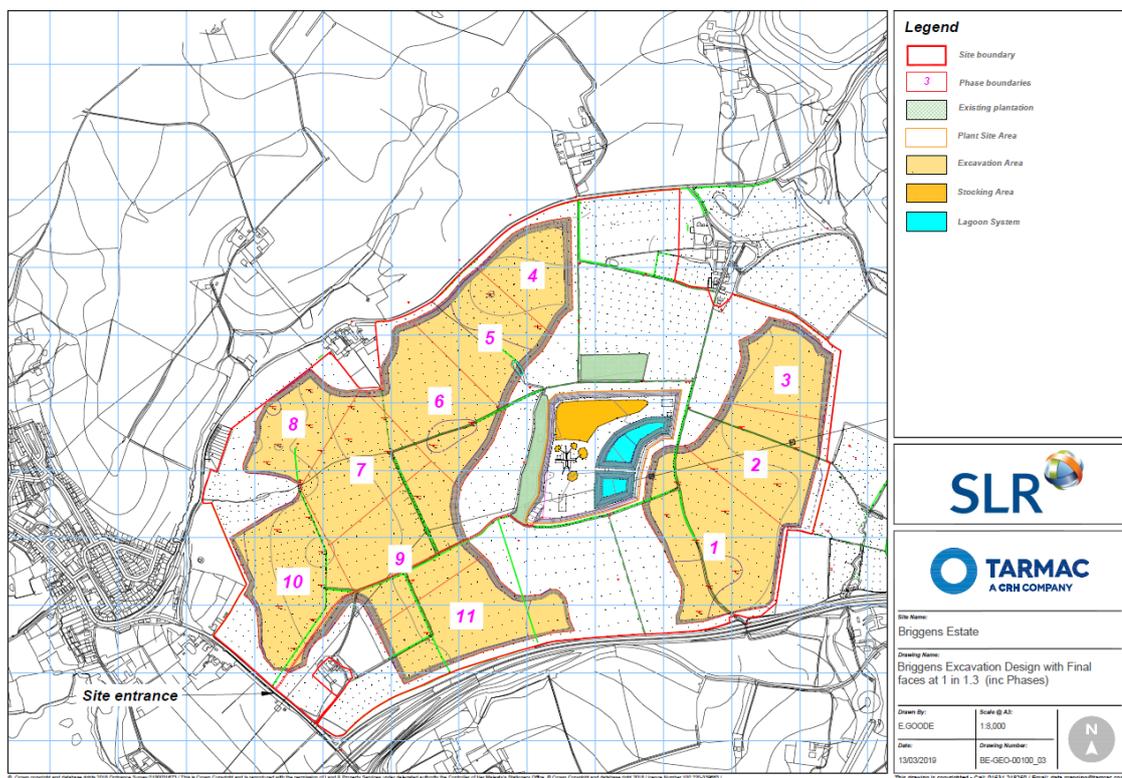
Indicative Gravel Extraction Phase & Layout Plan
